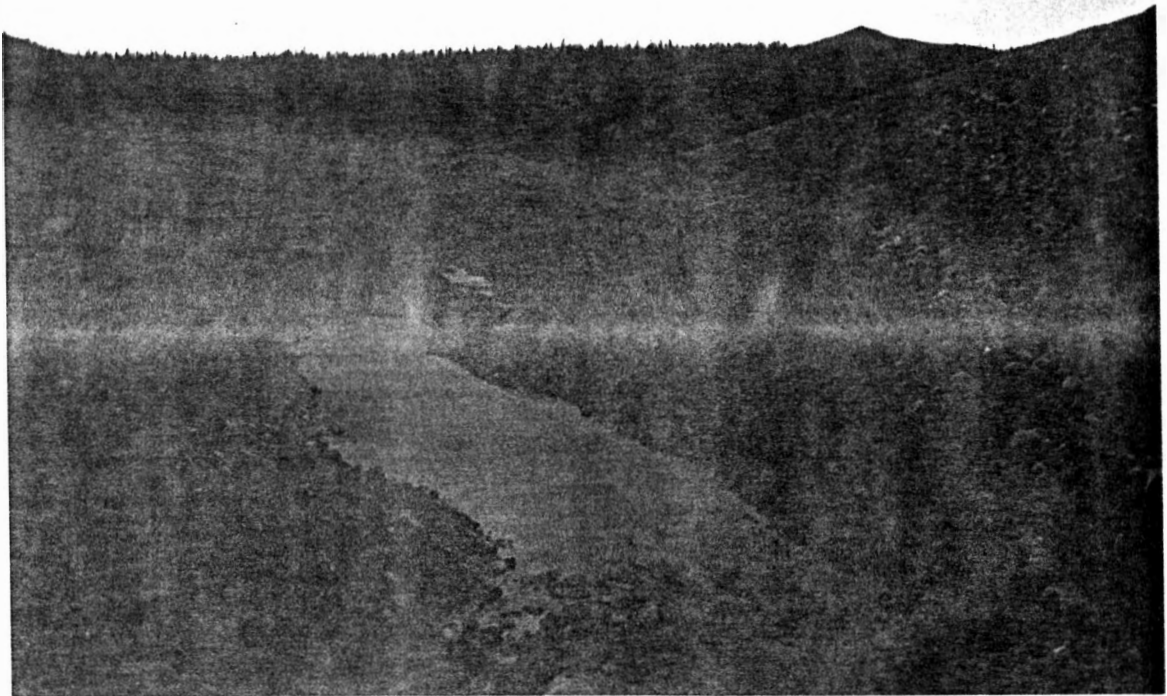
Seepage discharges from the south abutment and along the toe of the dam.
